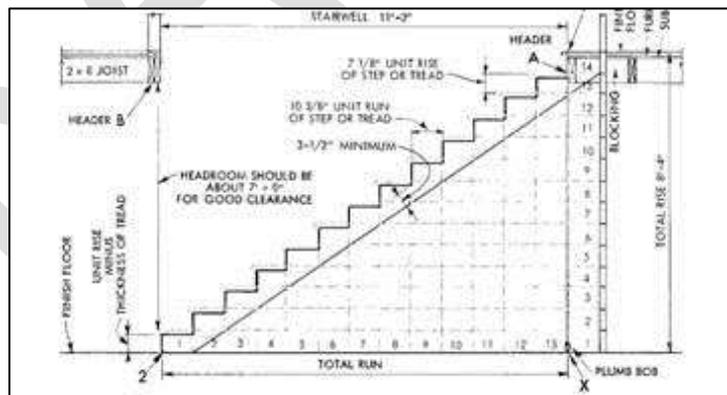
Typical riser and tread dimensions to cover a height of 8.33 feet
